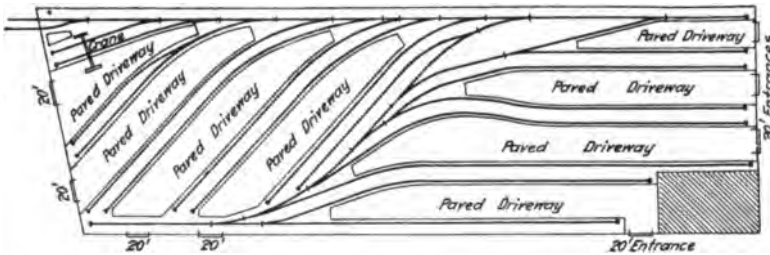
Lehigh Valley freight yard at West 27th Street, New York.
